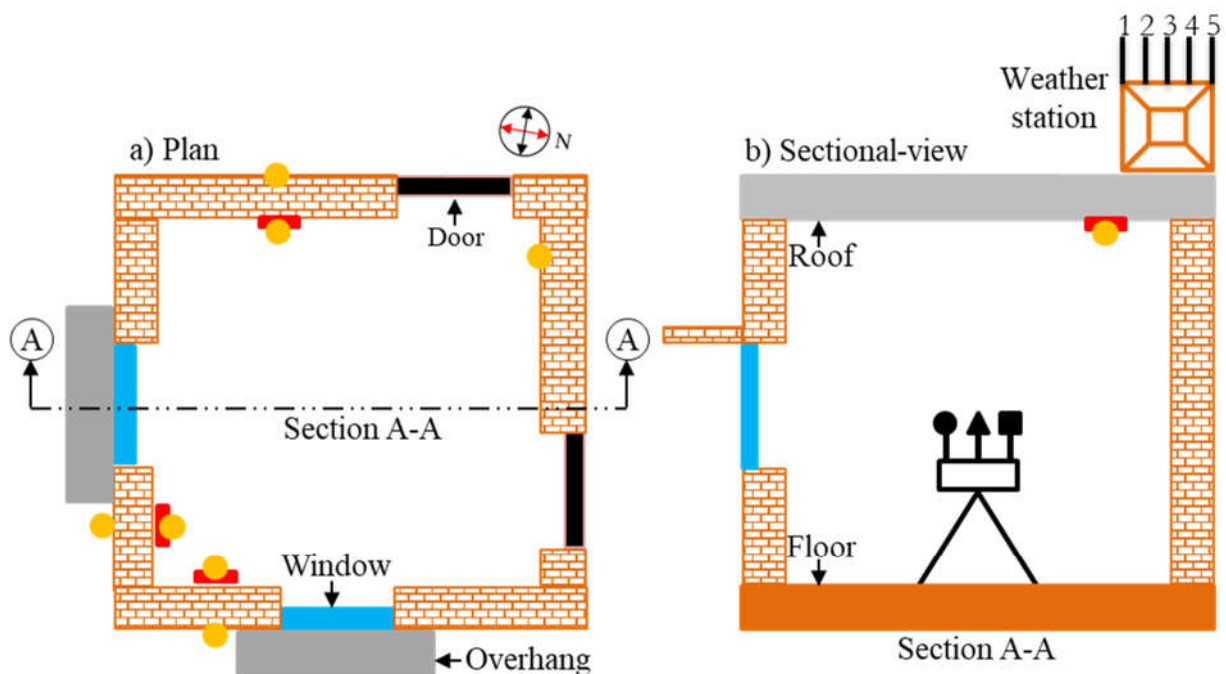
a) The monitored room in a single-story house and b) the floor plan.
